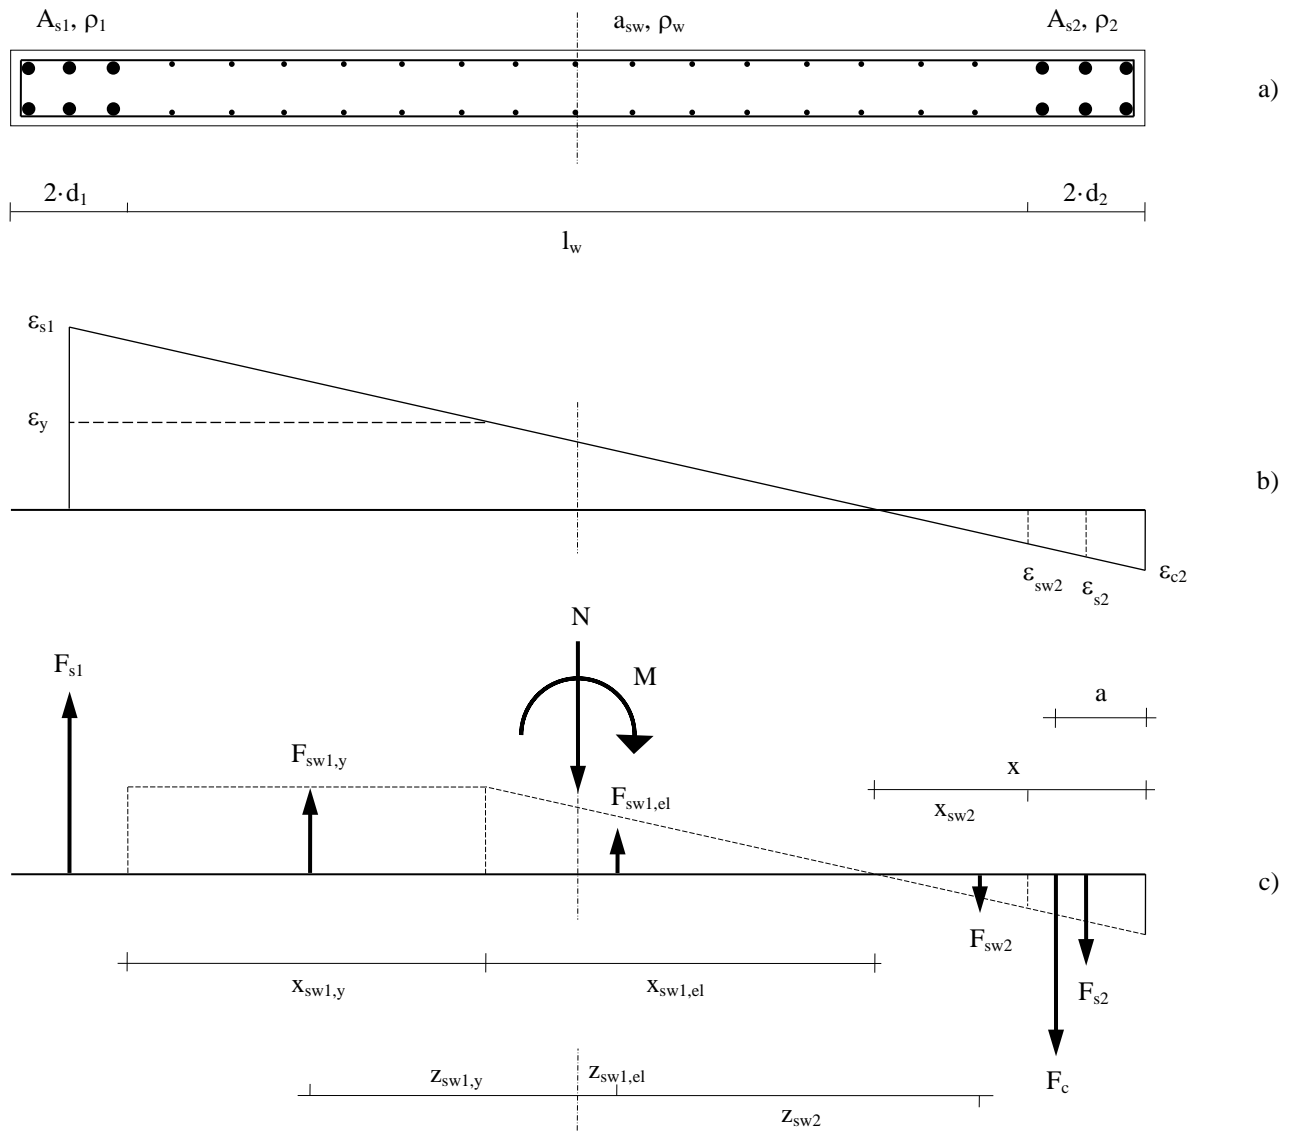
a) Cross section of a typical earthquake shear wall; b) strain distribution; c) forces
